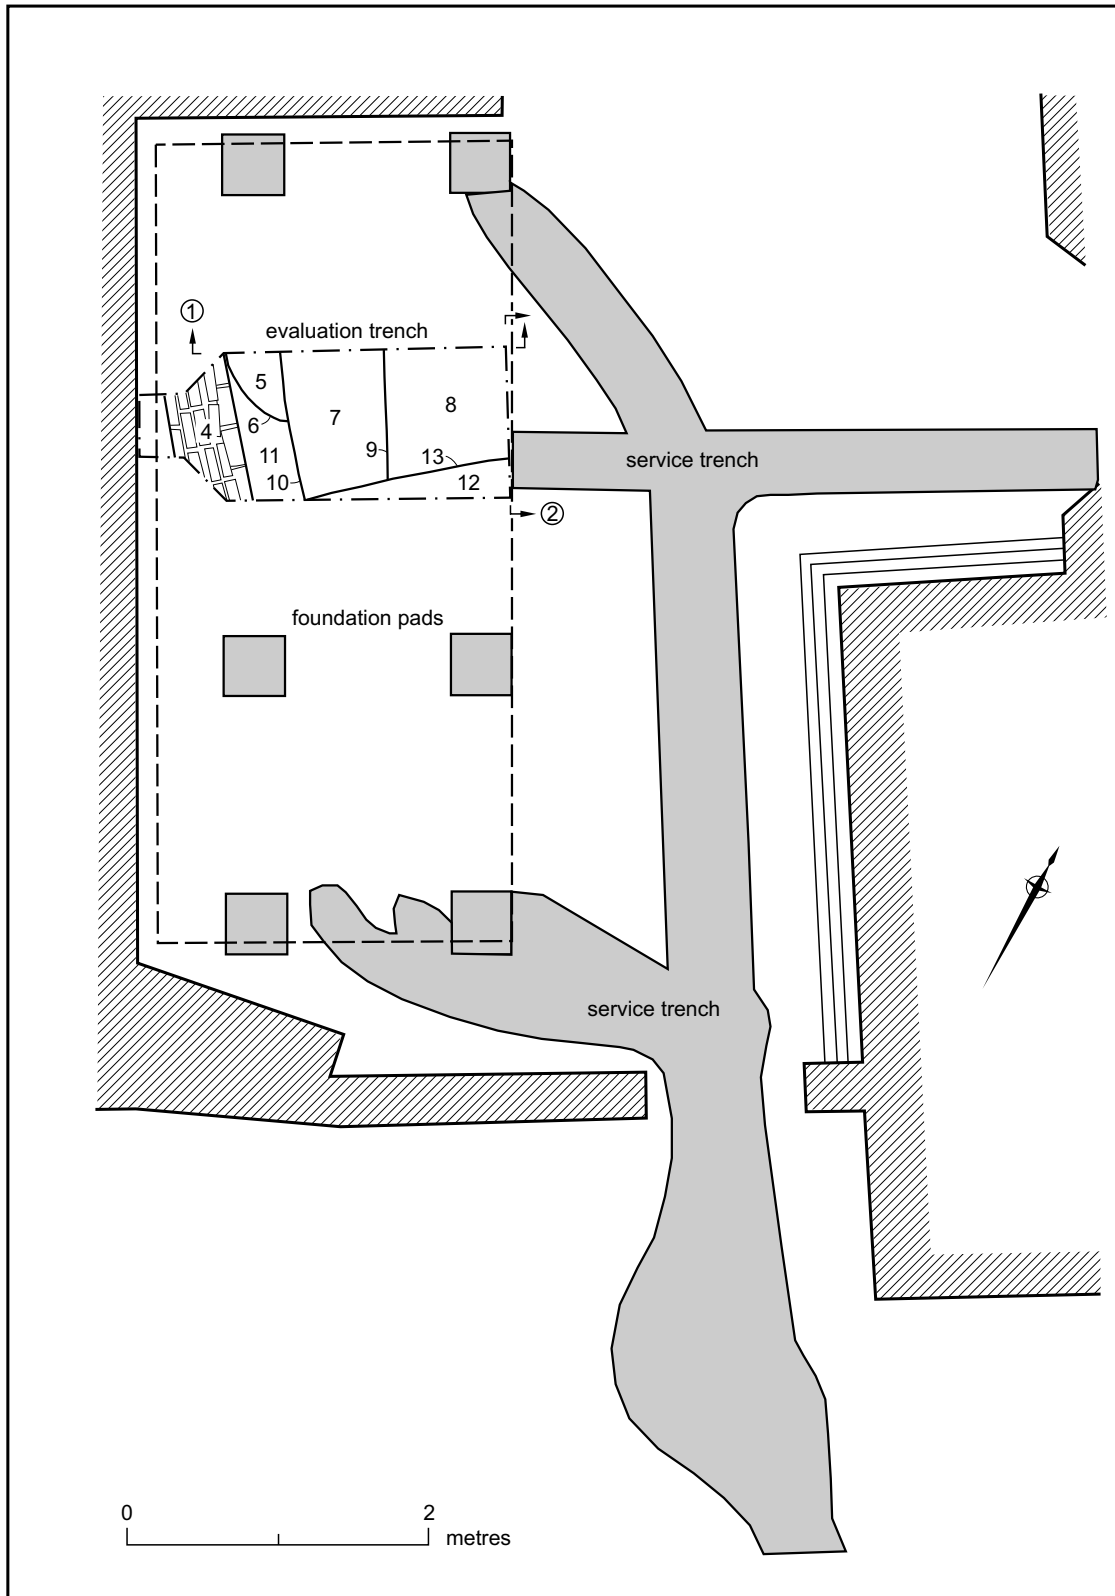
Plan of observations in the area of the new toilet block. Scale 1:50.
